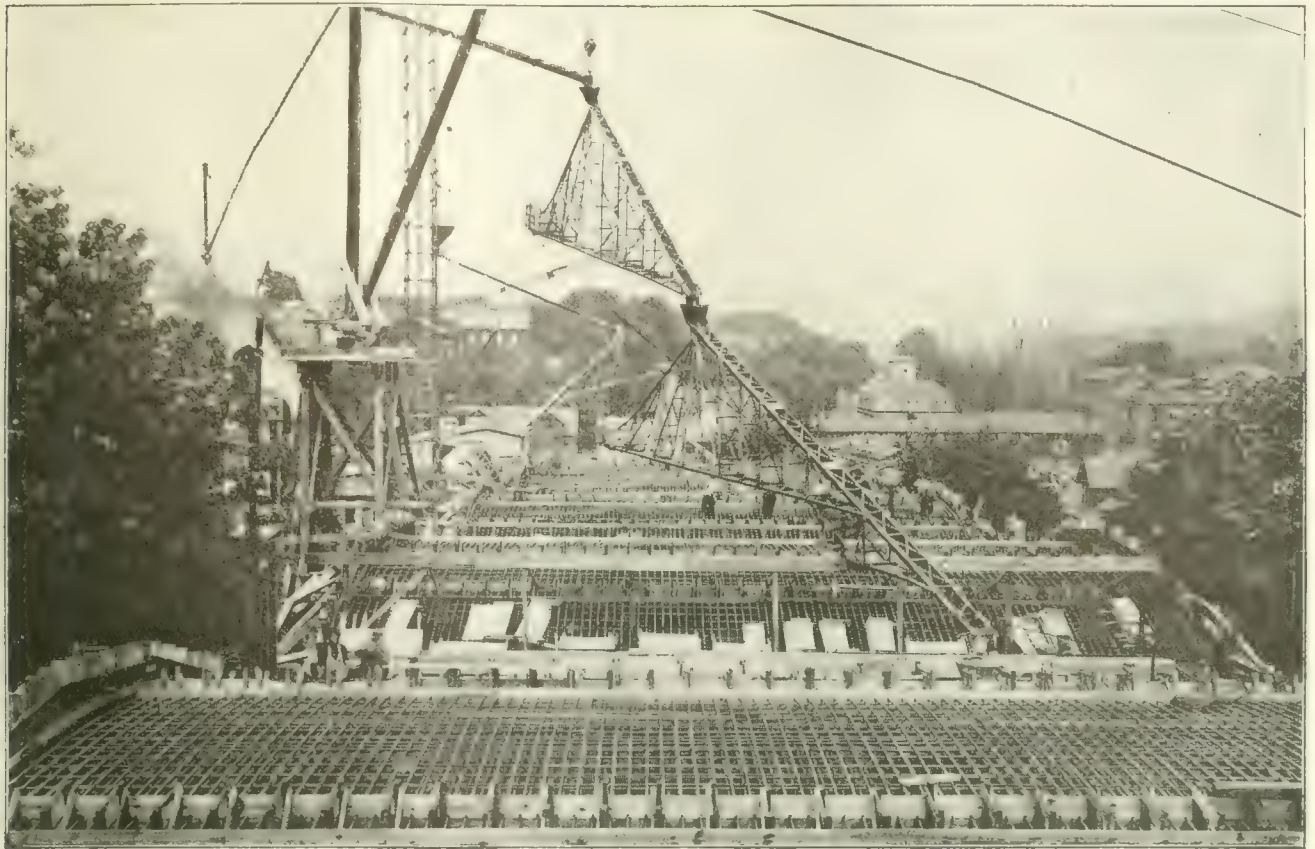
STIFF LEG DERRICKS MOUNTED ON 40-FT. STAGING ARE REDISTRIBUTION TOWERS
